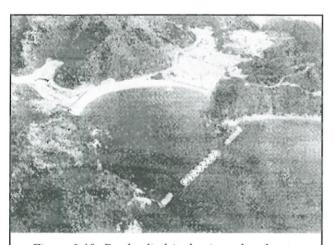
Dual cylindrical caisson breakwater at Nagashima Port, Japan (taken from Tanimoto et al. 1994).
